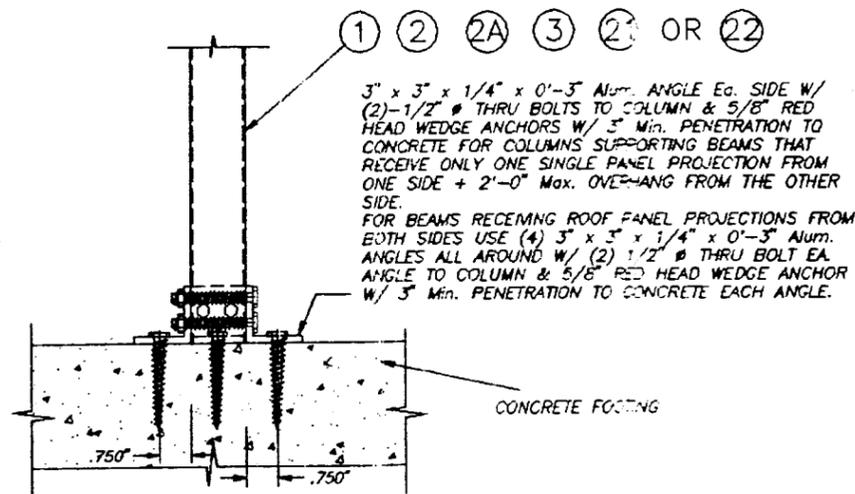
BRACING CONNECTION DETAIL (ELEVATION)
